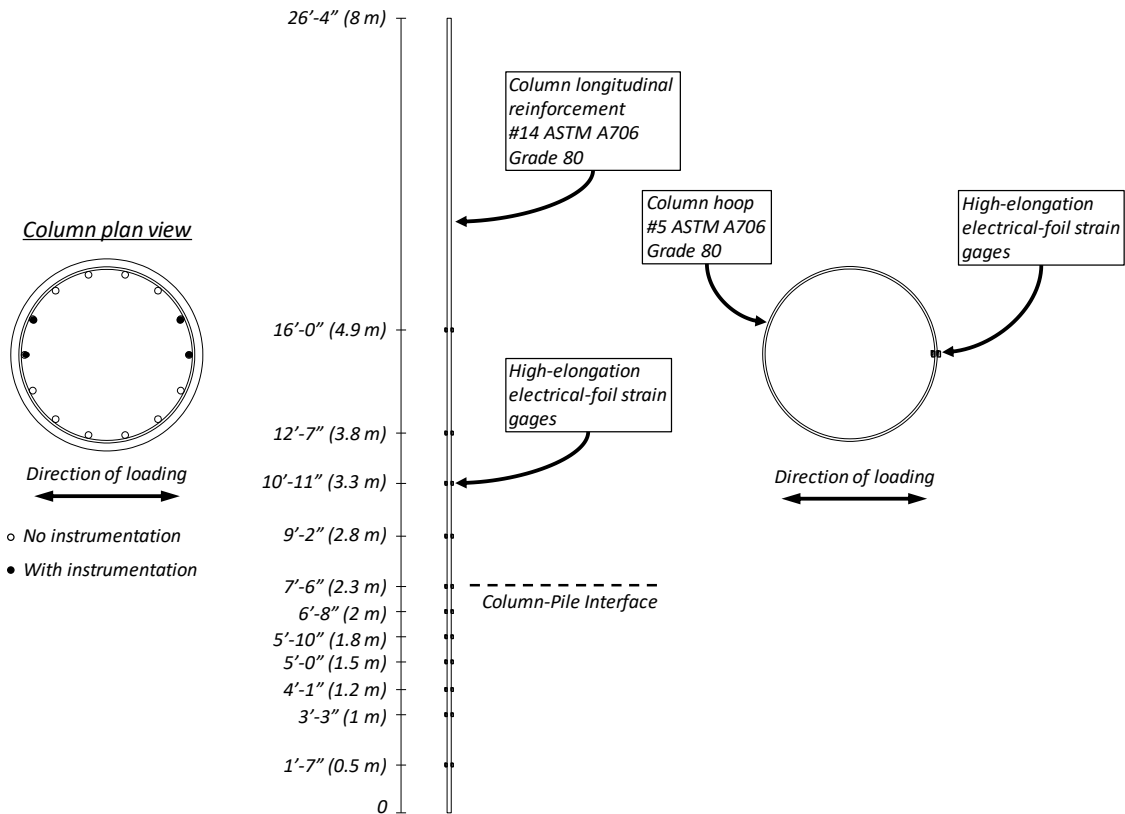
Representative Column Longitudinal and Transverse Reinforcement Instrumentation
